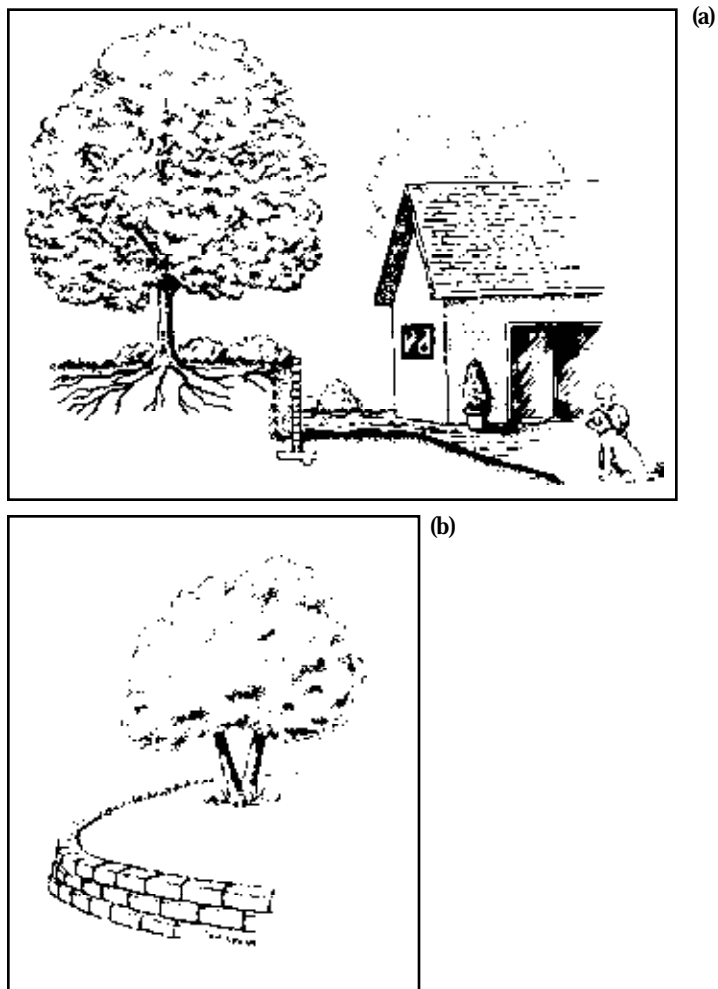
After cutting a grade near trees (a or b), build a retaining wall to prevent soil erosion.
